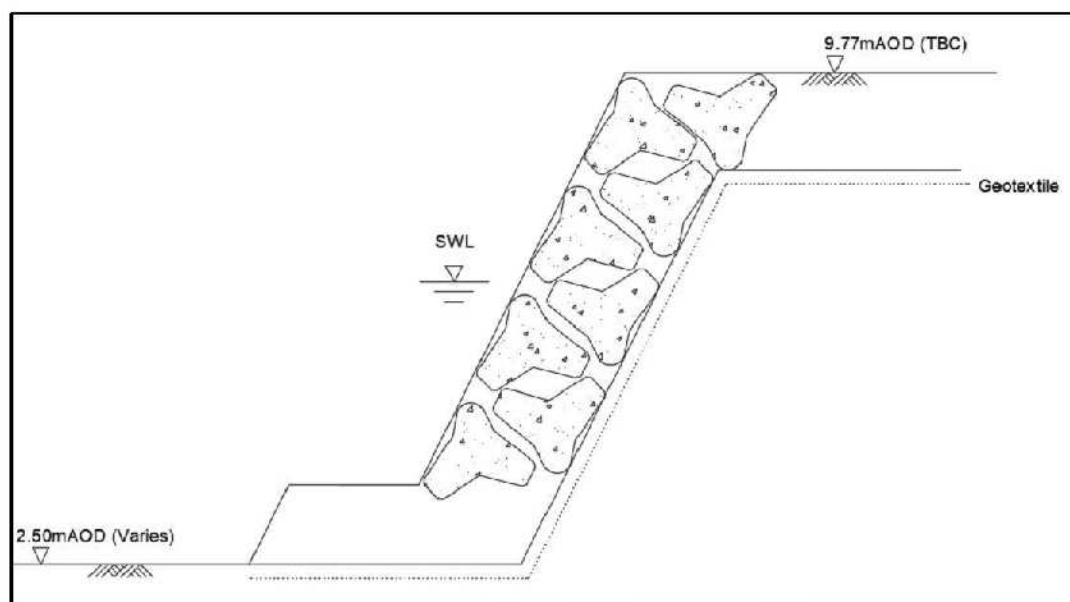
Illustrative sketch of a Concrete Block Armour Revetment (not to scale).
